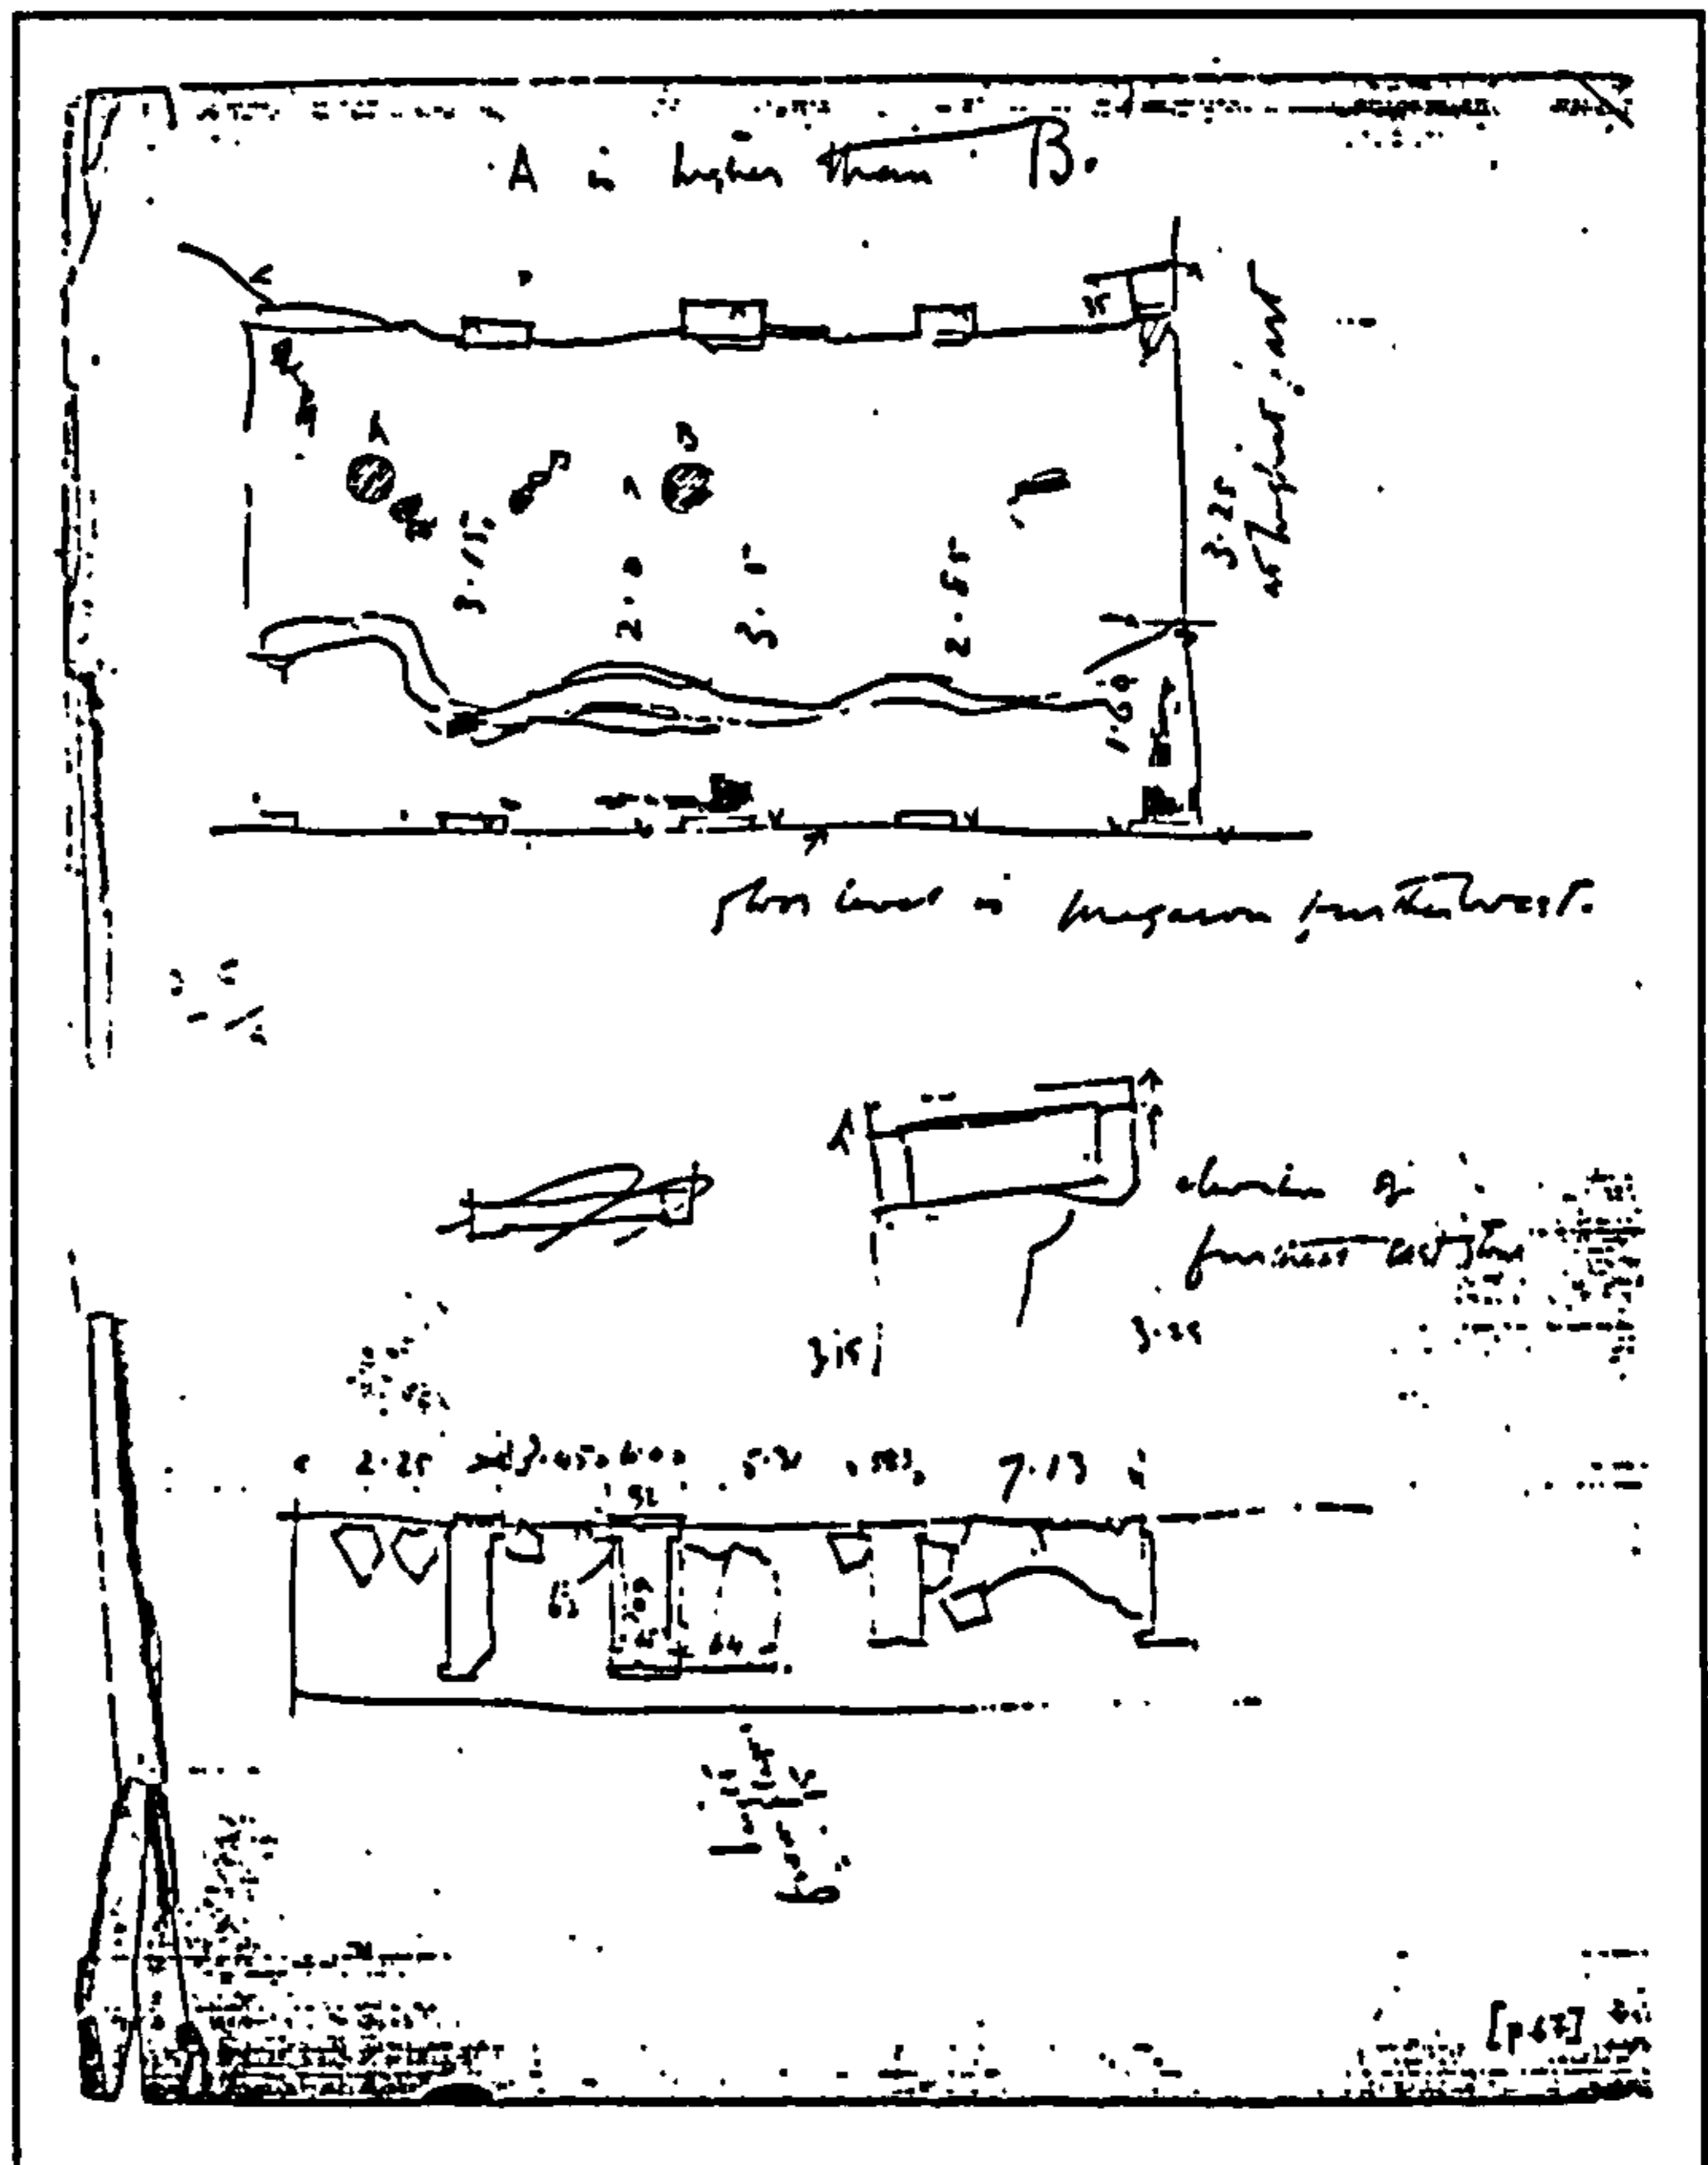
Sketch elevation (top) and ground plan (bottom) of the door jambs of the Hall of the Double Axes. Theodore Fyfe, Notebook 1901.
